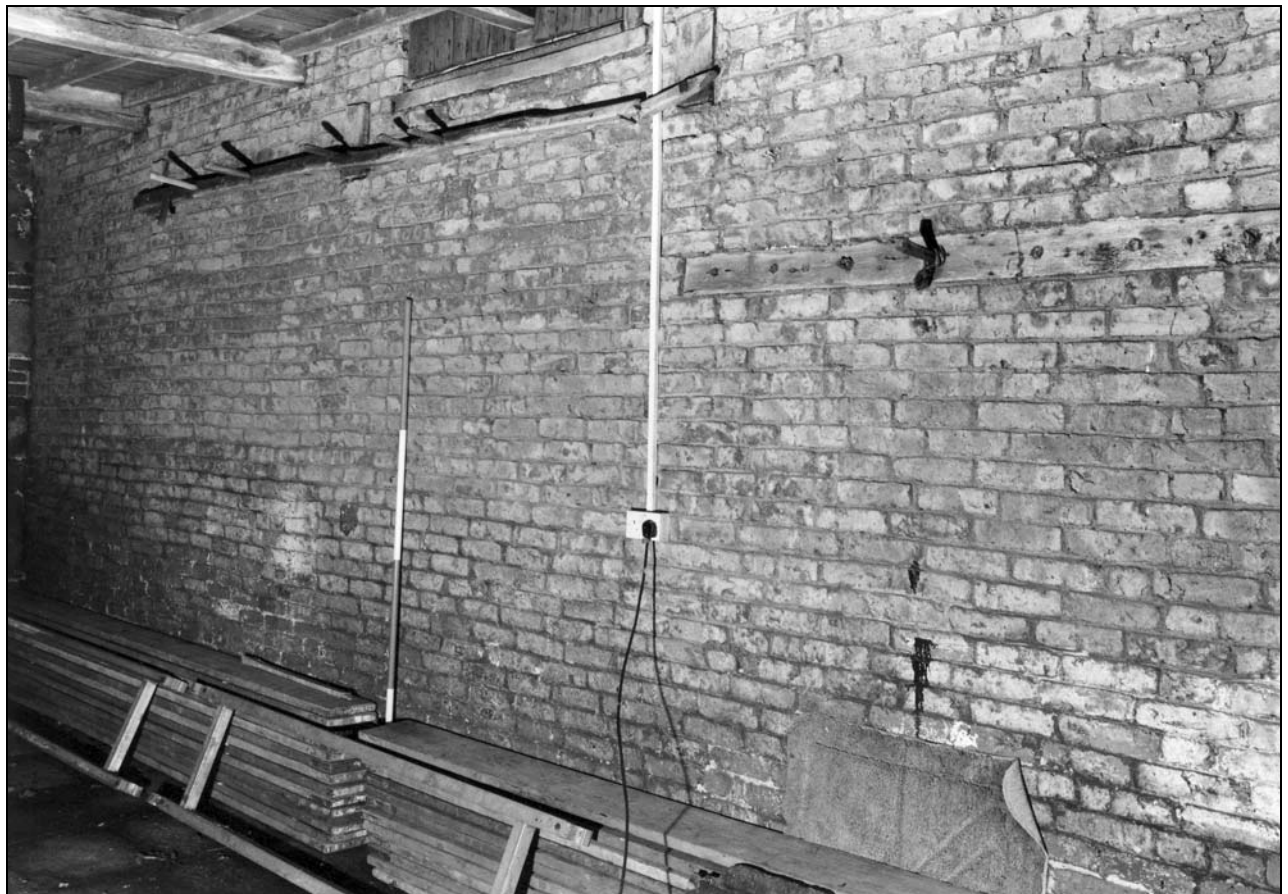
Brick wall on east side of central bay, from the south-west (note harness pegs) (film 3, frame 4)
